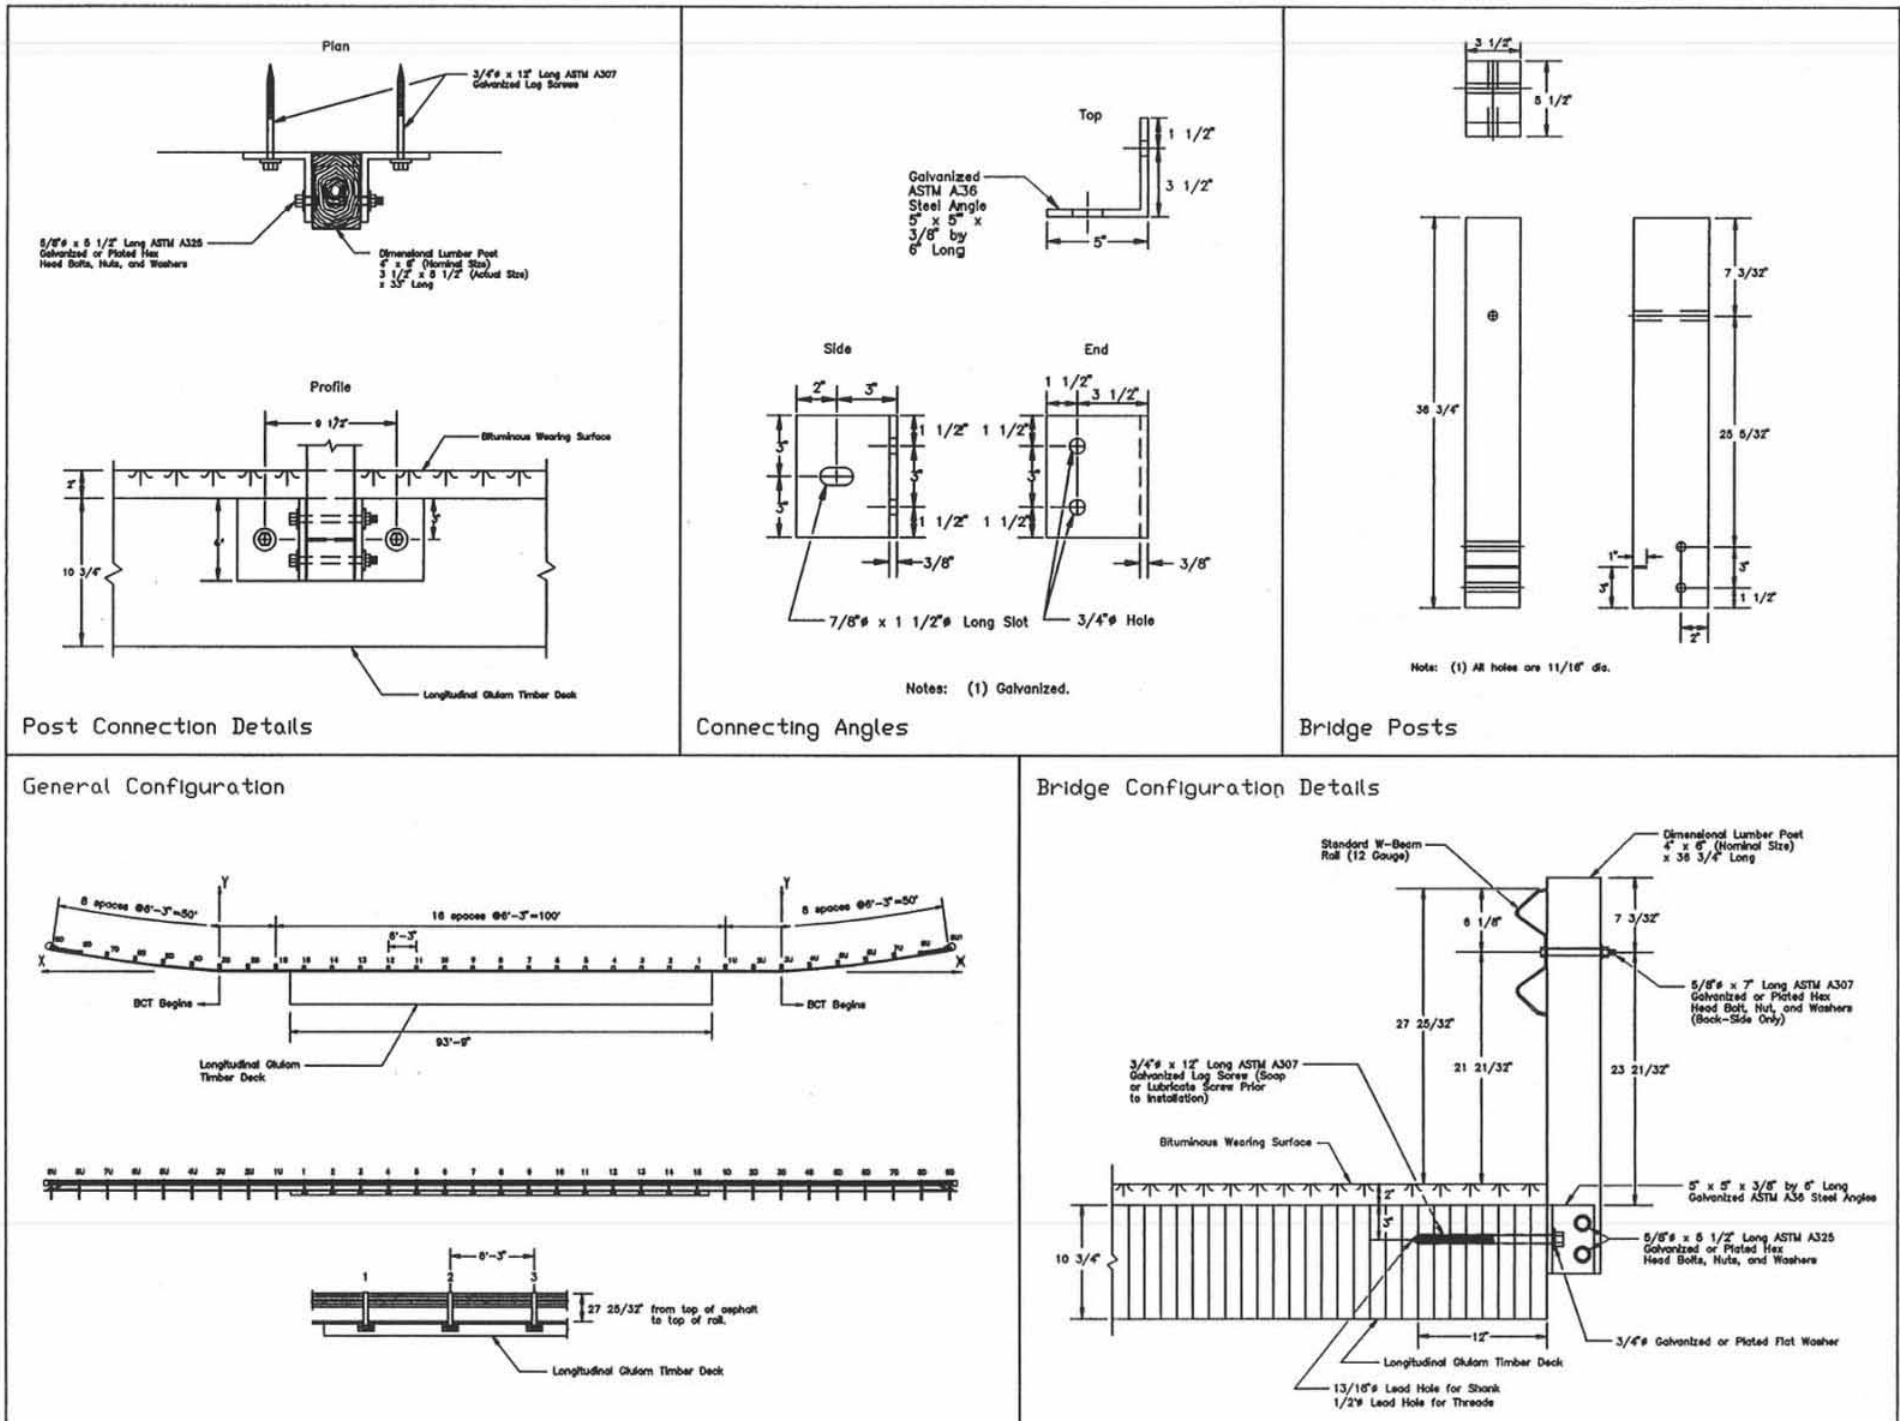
Flexible W-Beam Bridge Railing System Design Details, Design No. 2
